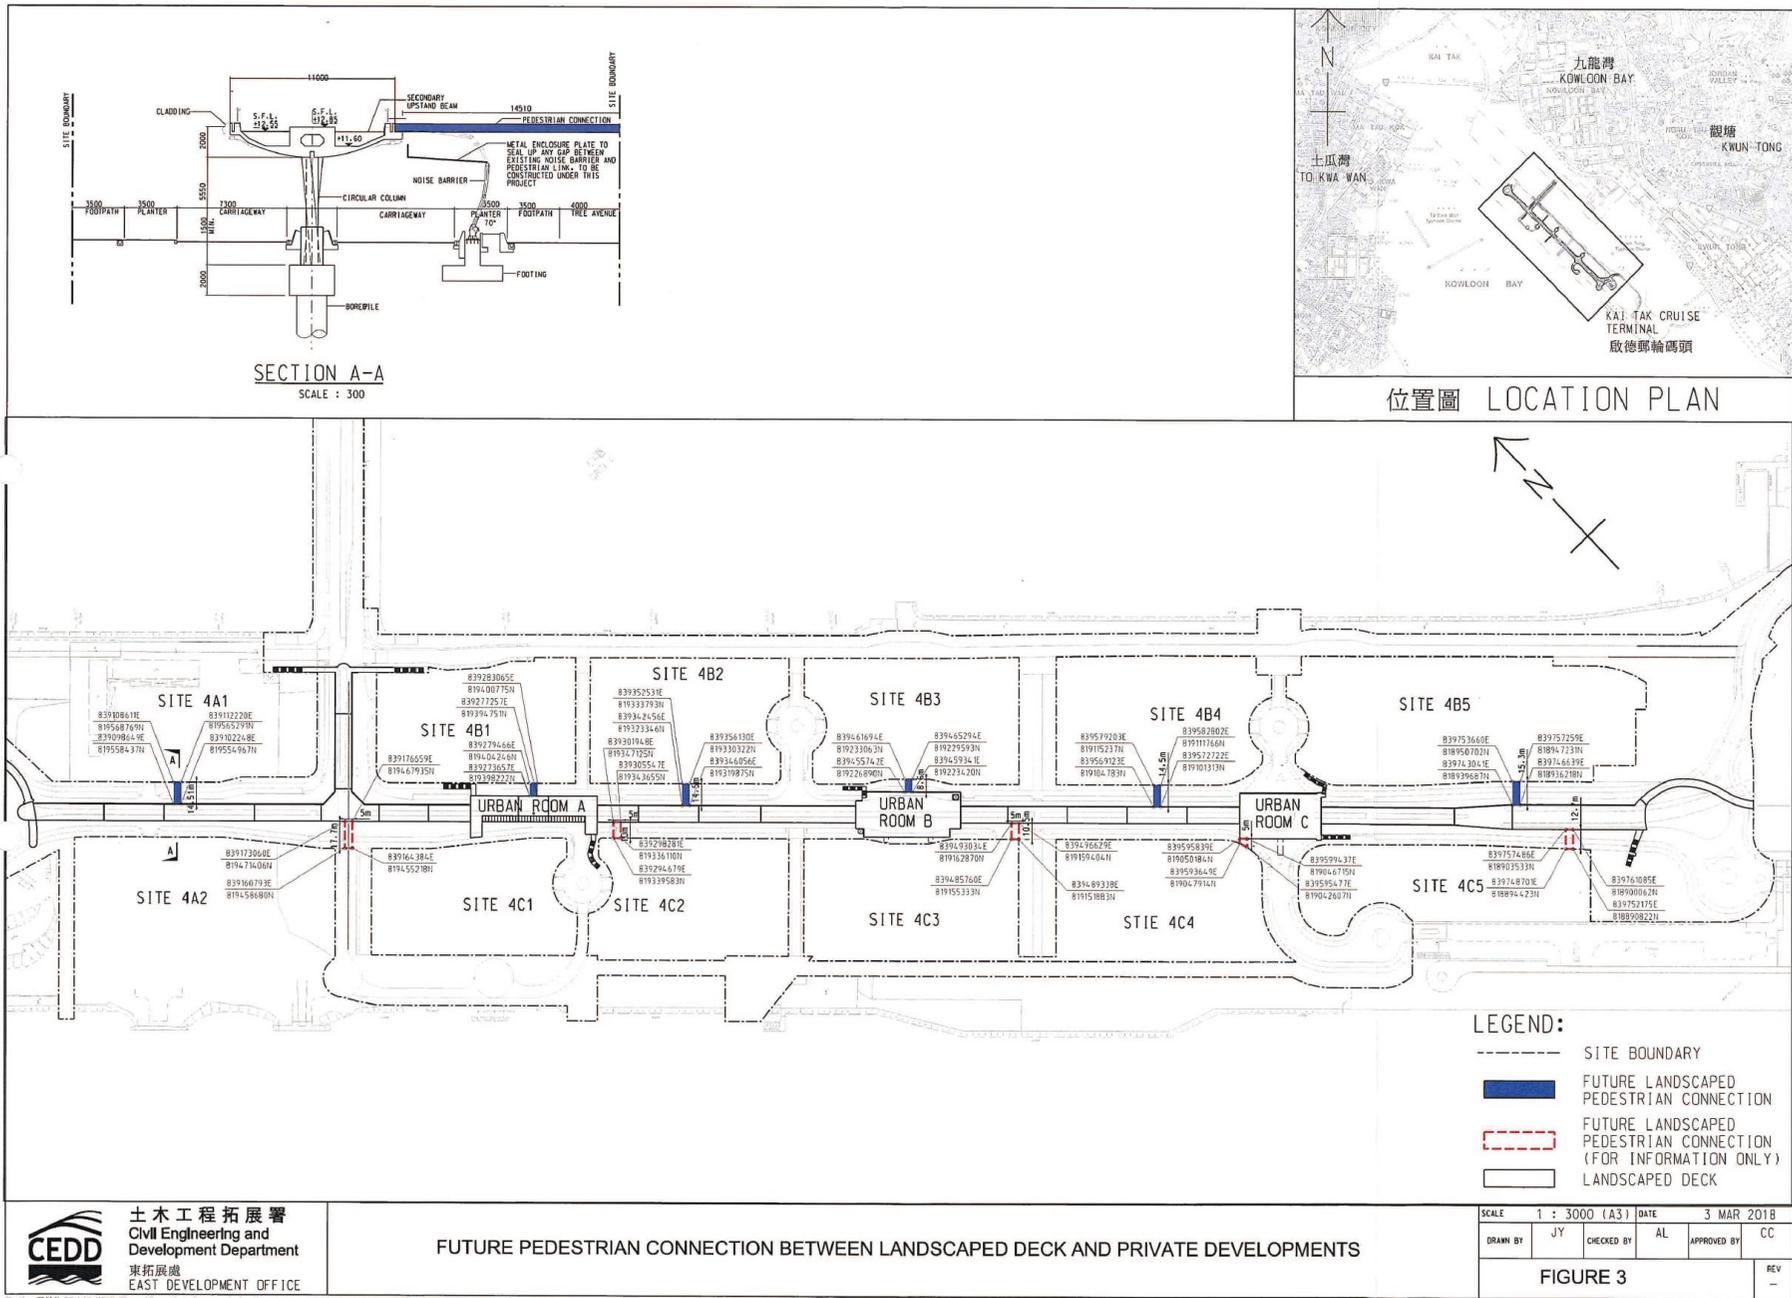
Future Pedestrian Connection Between Landscaped Deck And Private Developments
